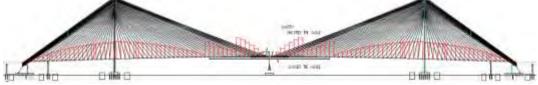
Erection stage – install second tie, continue cantilevering and controlling tie forces
